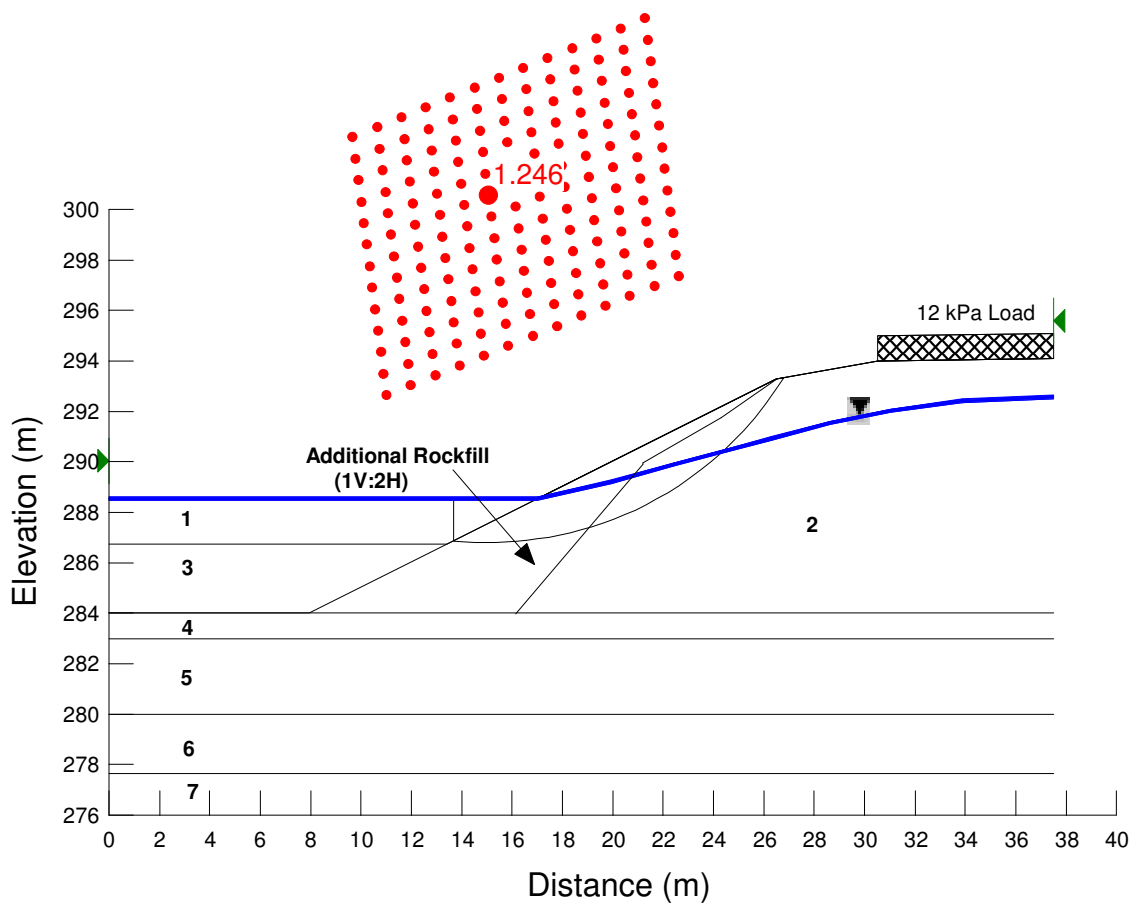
Stability of HWY11 Road Section at Sta. 14+800
